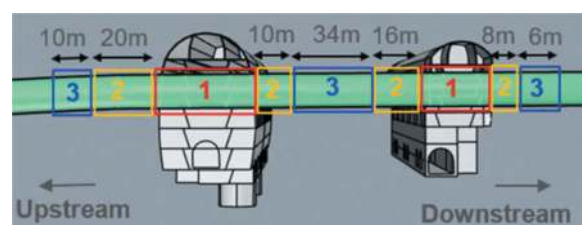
Lining damages zoning around MAT01 – caverns intersections. Cavern excavation benching is shown.
